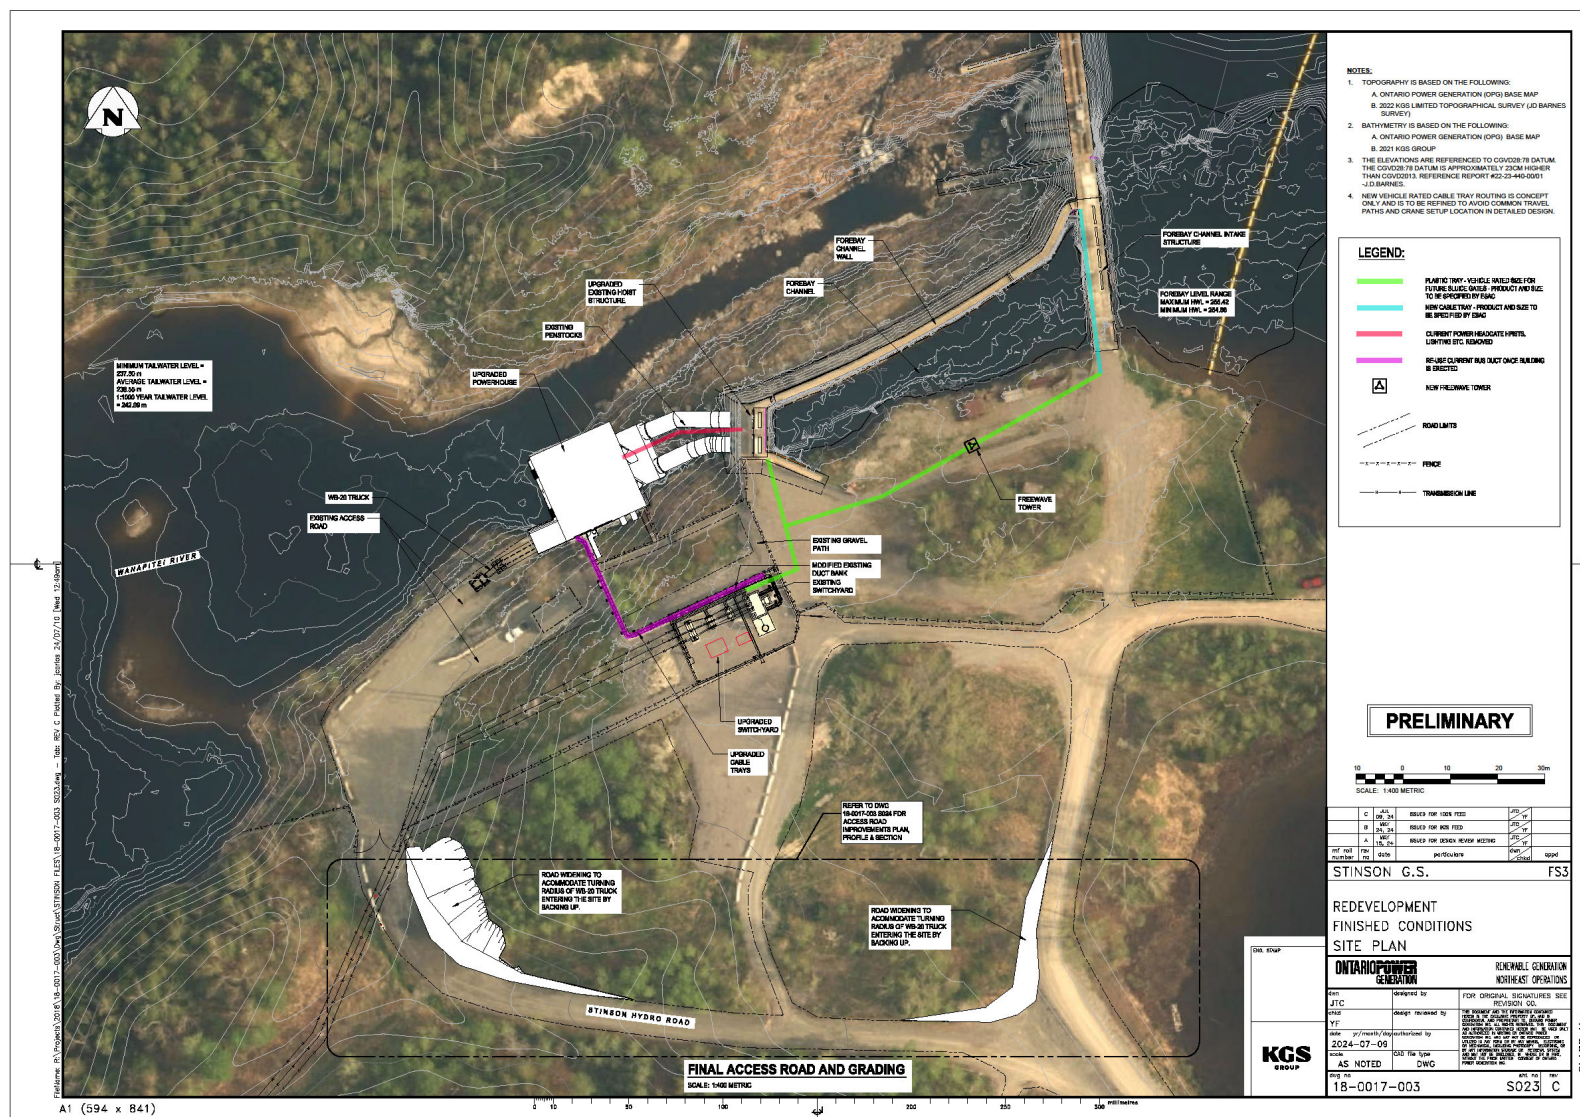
Proposed General Arrangement Site Plan for the Stinson GS
